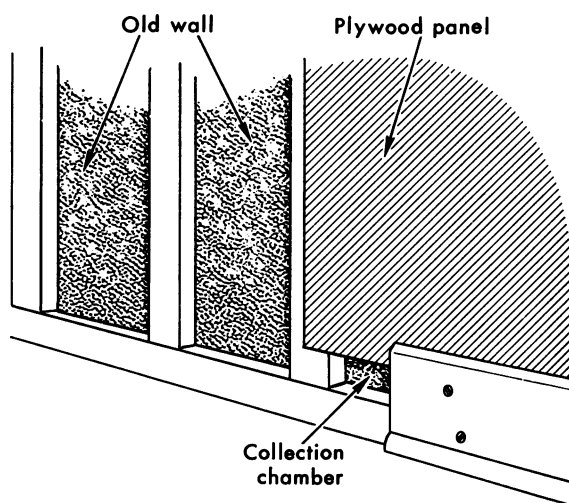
Design of false walls of paneling used for shielding and removable baseboards
